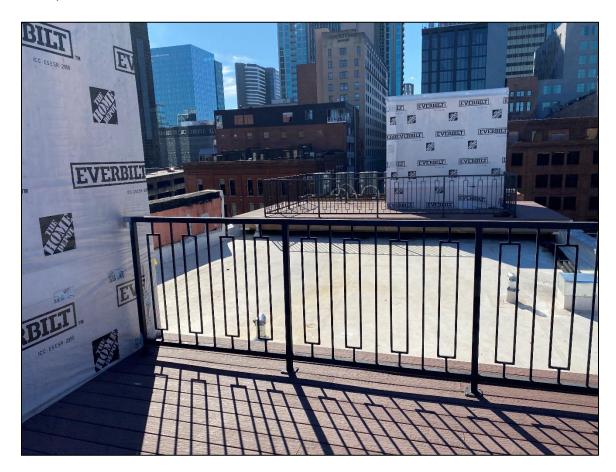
The rooftop addition as seen from the rear deck, looking towards the front of the building.
